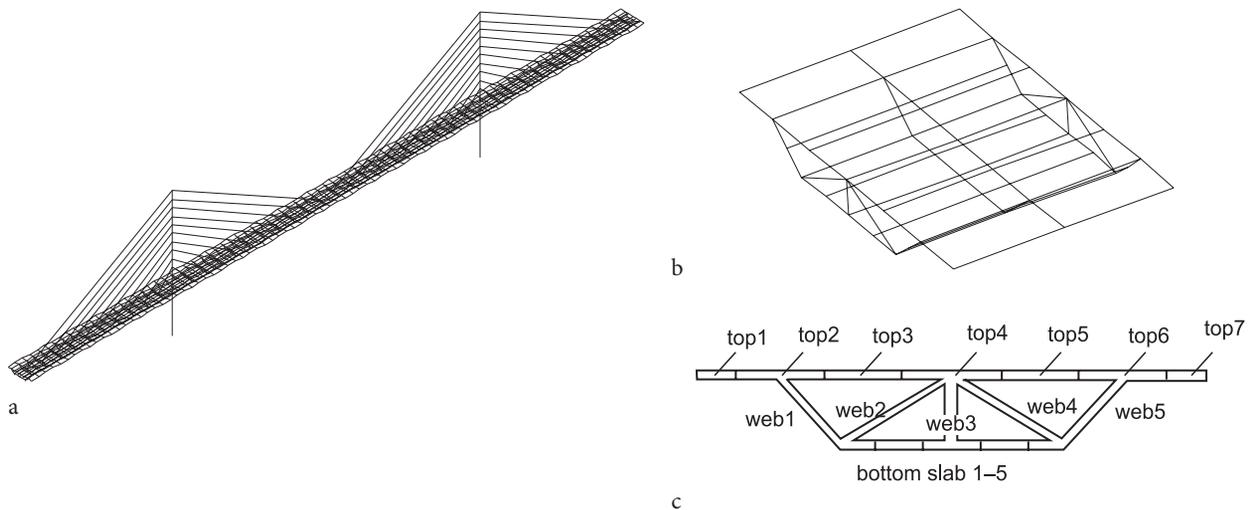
Space frame lattice model of prestressed concrete cable-stayed bridge: a – space frame lattice model of whole bridge; b – a segment; c – section divided
